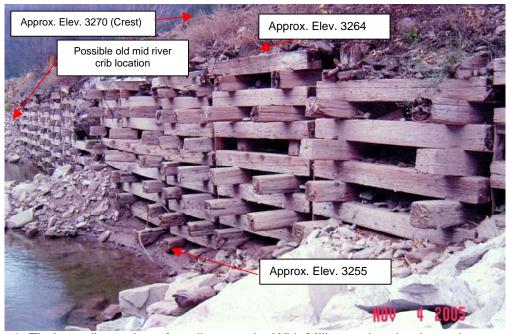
Timber crib section of cooling pond. With Milltown dam in place, the water surface elevation of the Blackfoot River is at elevation 3262 ft. In this photo, water was drawn down for removal of the Stimson dam.
